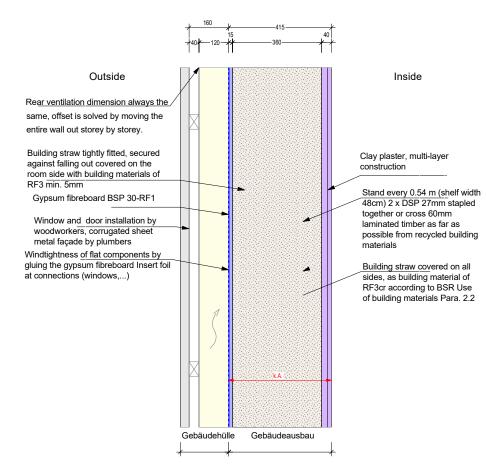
DETAIL SECTION OF THE K118 FAÇADE IN WINTERTHUR © IN SITU
